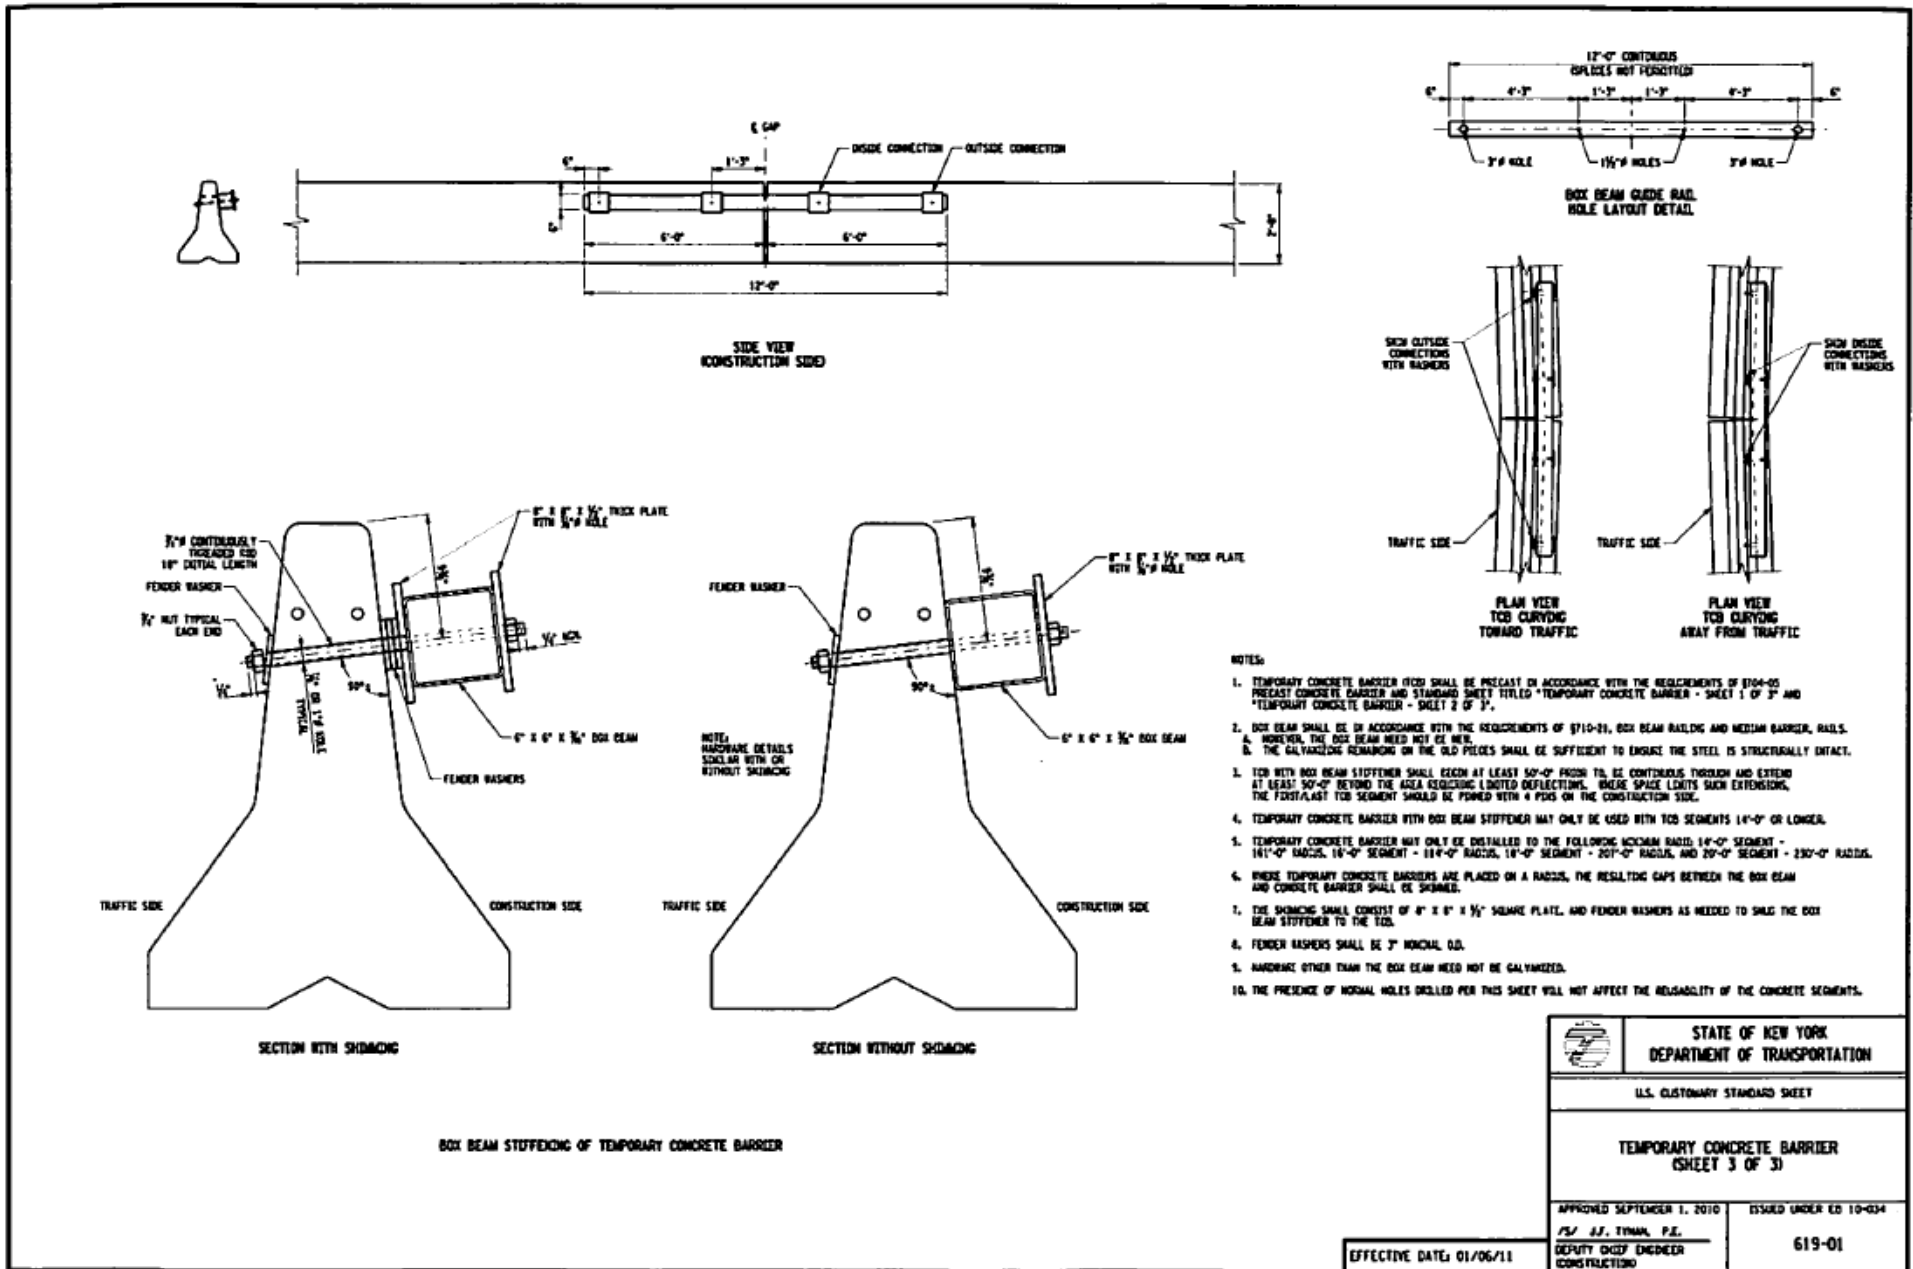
Cont'd. - NYS Temporary Concrete Barrier with Stiffened Beam Connection Details
